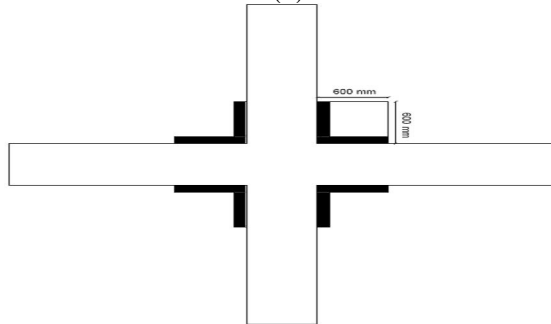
specimen of C₁-C₂ intermediate strengthened joints before and after beam and column wrapping
